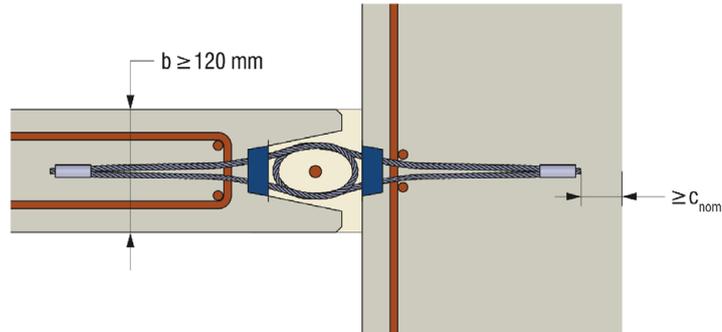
Wall – Wall – T-Connection - Standard detail (*flat installation*)
